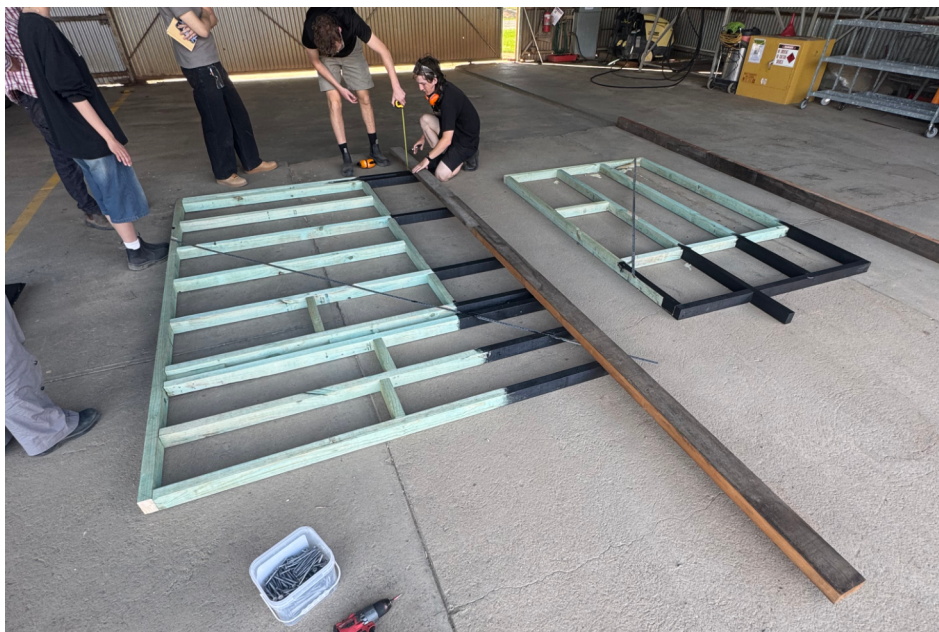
Oregon Fascia Beams being fixed on the wall
